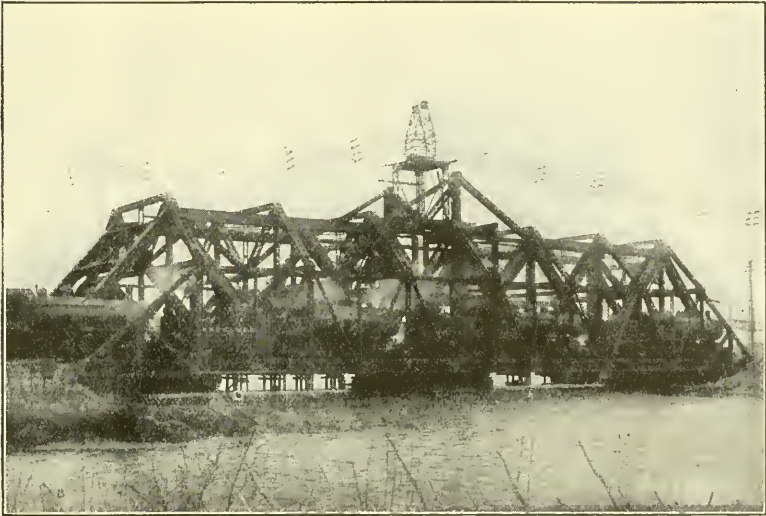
FOUR-TRACK, CENTER-BEARING, RAILROAD DRAW SPAN AT CONNEAUT HARBOR, OHIO, DURING LOADING TEST.
